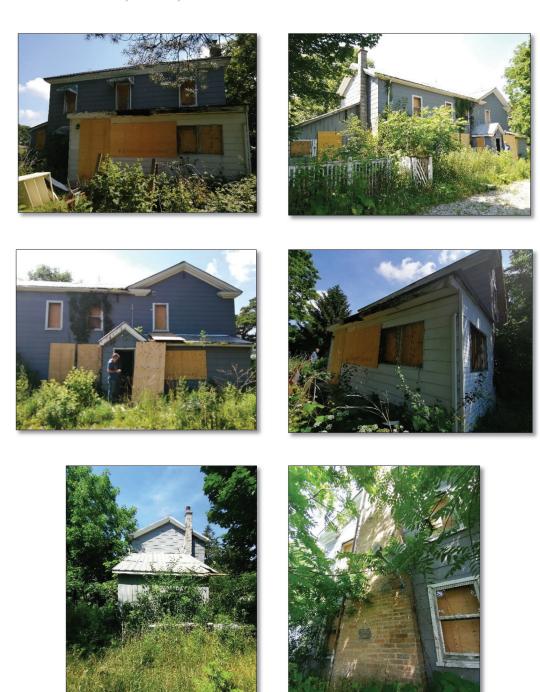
, 19, 20, 21, 22 & 23: (above left) View of front façade of house; (above right) View of north elevation of house; (middle left) View of north elevation of the house; (middle right) South and west (front) elevation showing poor additions; (below left) View of east (rear) elevation; (below right) View of brick and fieldstone chimeny shift (MHBC, 2021).
